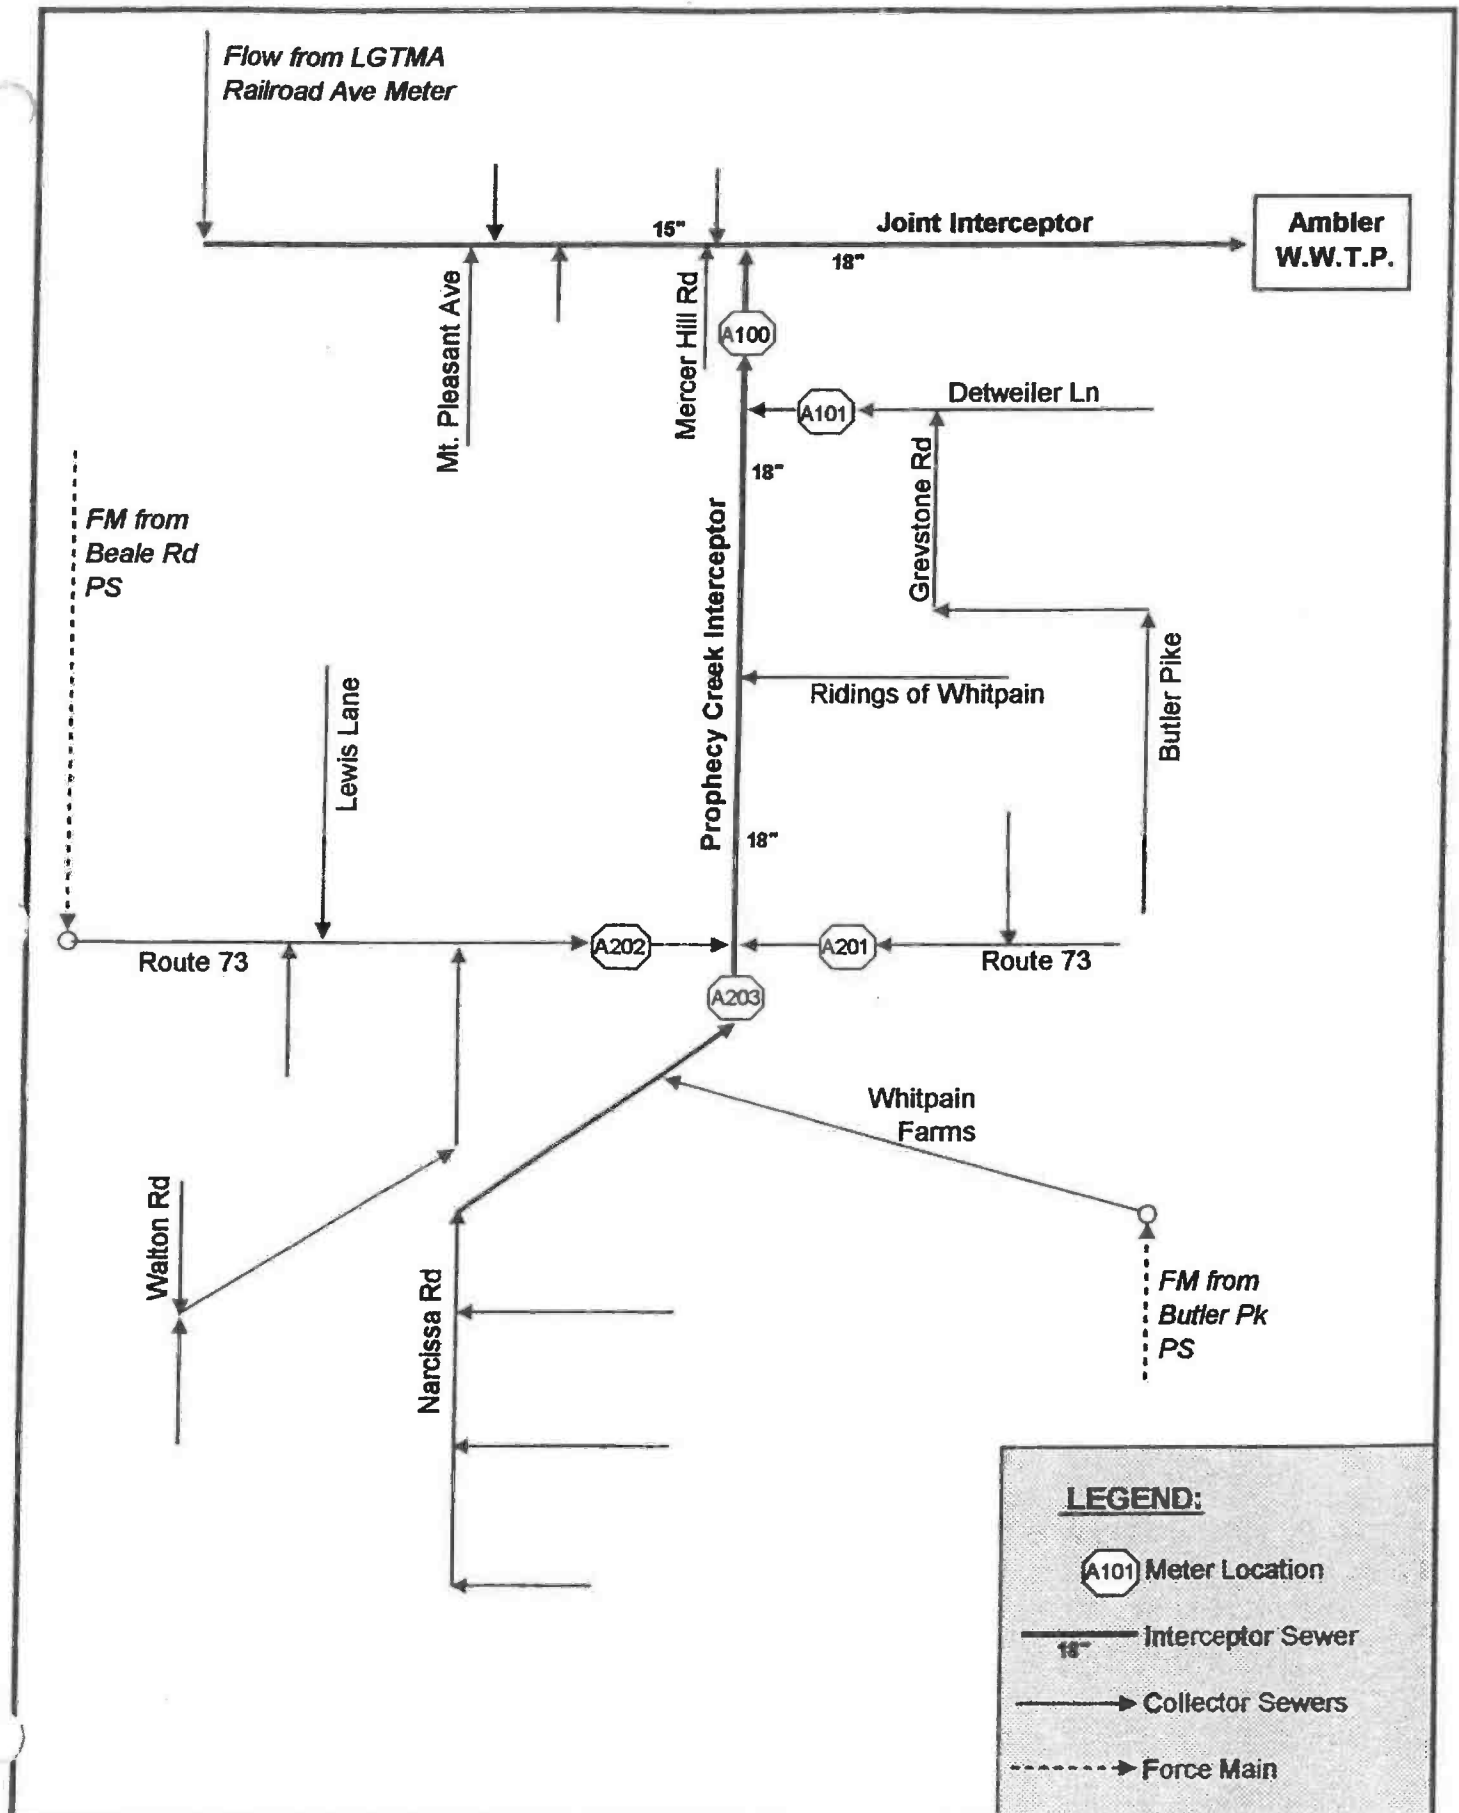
SCHEMATIC PLAN OF AMBLER SEWER DISTRICT METERING
